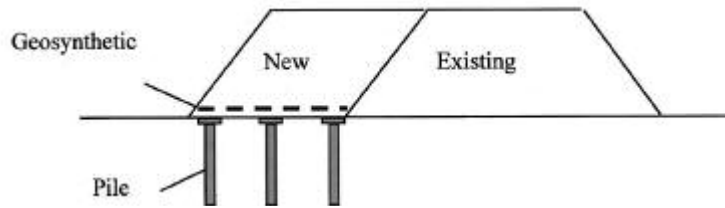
Widening of Existing Road (Han and Gabr, 2002)
